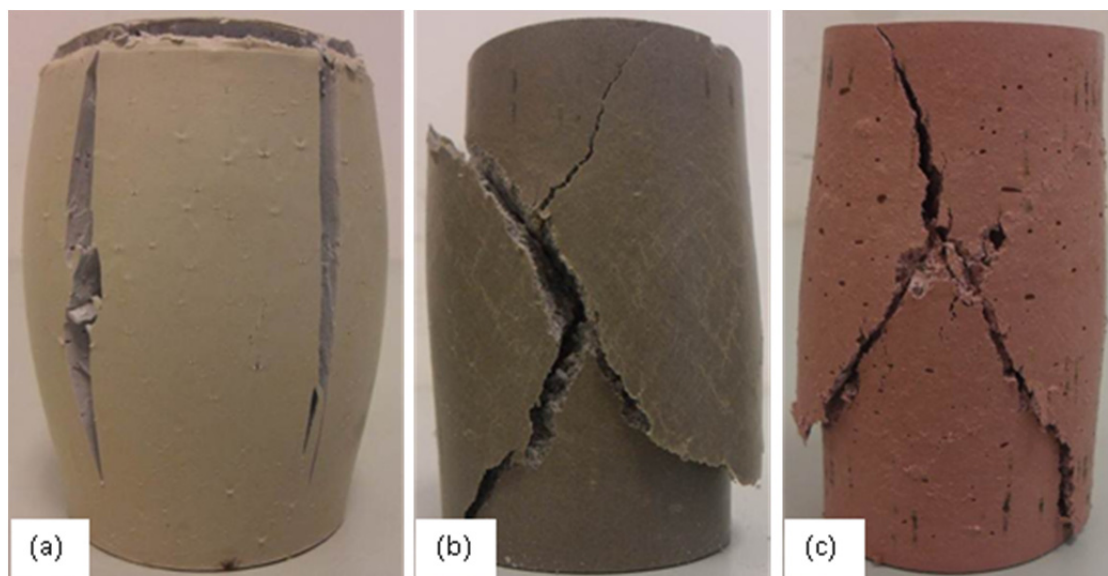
Typical failure patterns of 50 mm cylindrical specimens under compression; (a) grout C, (b) grout D and (c) grout E
